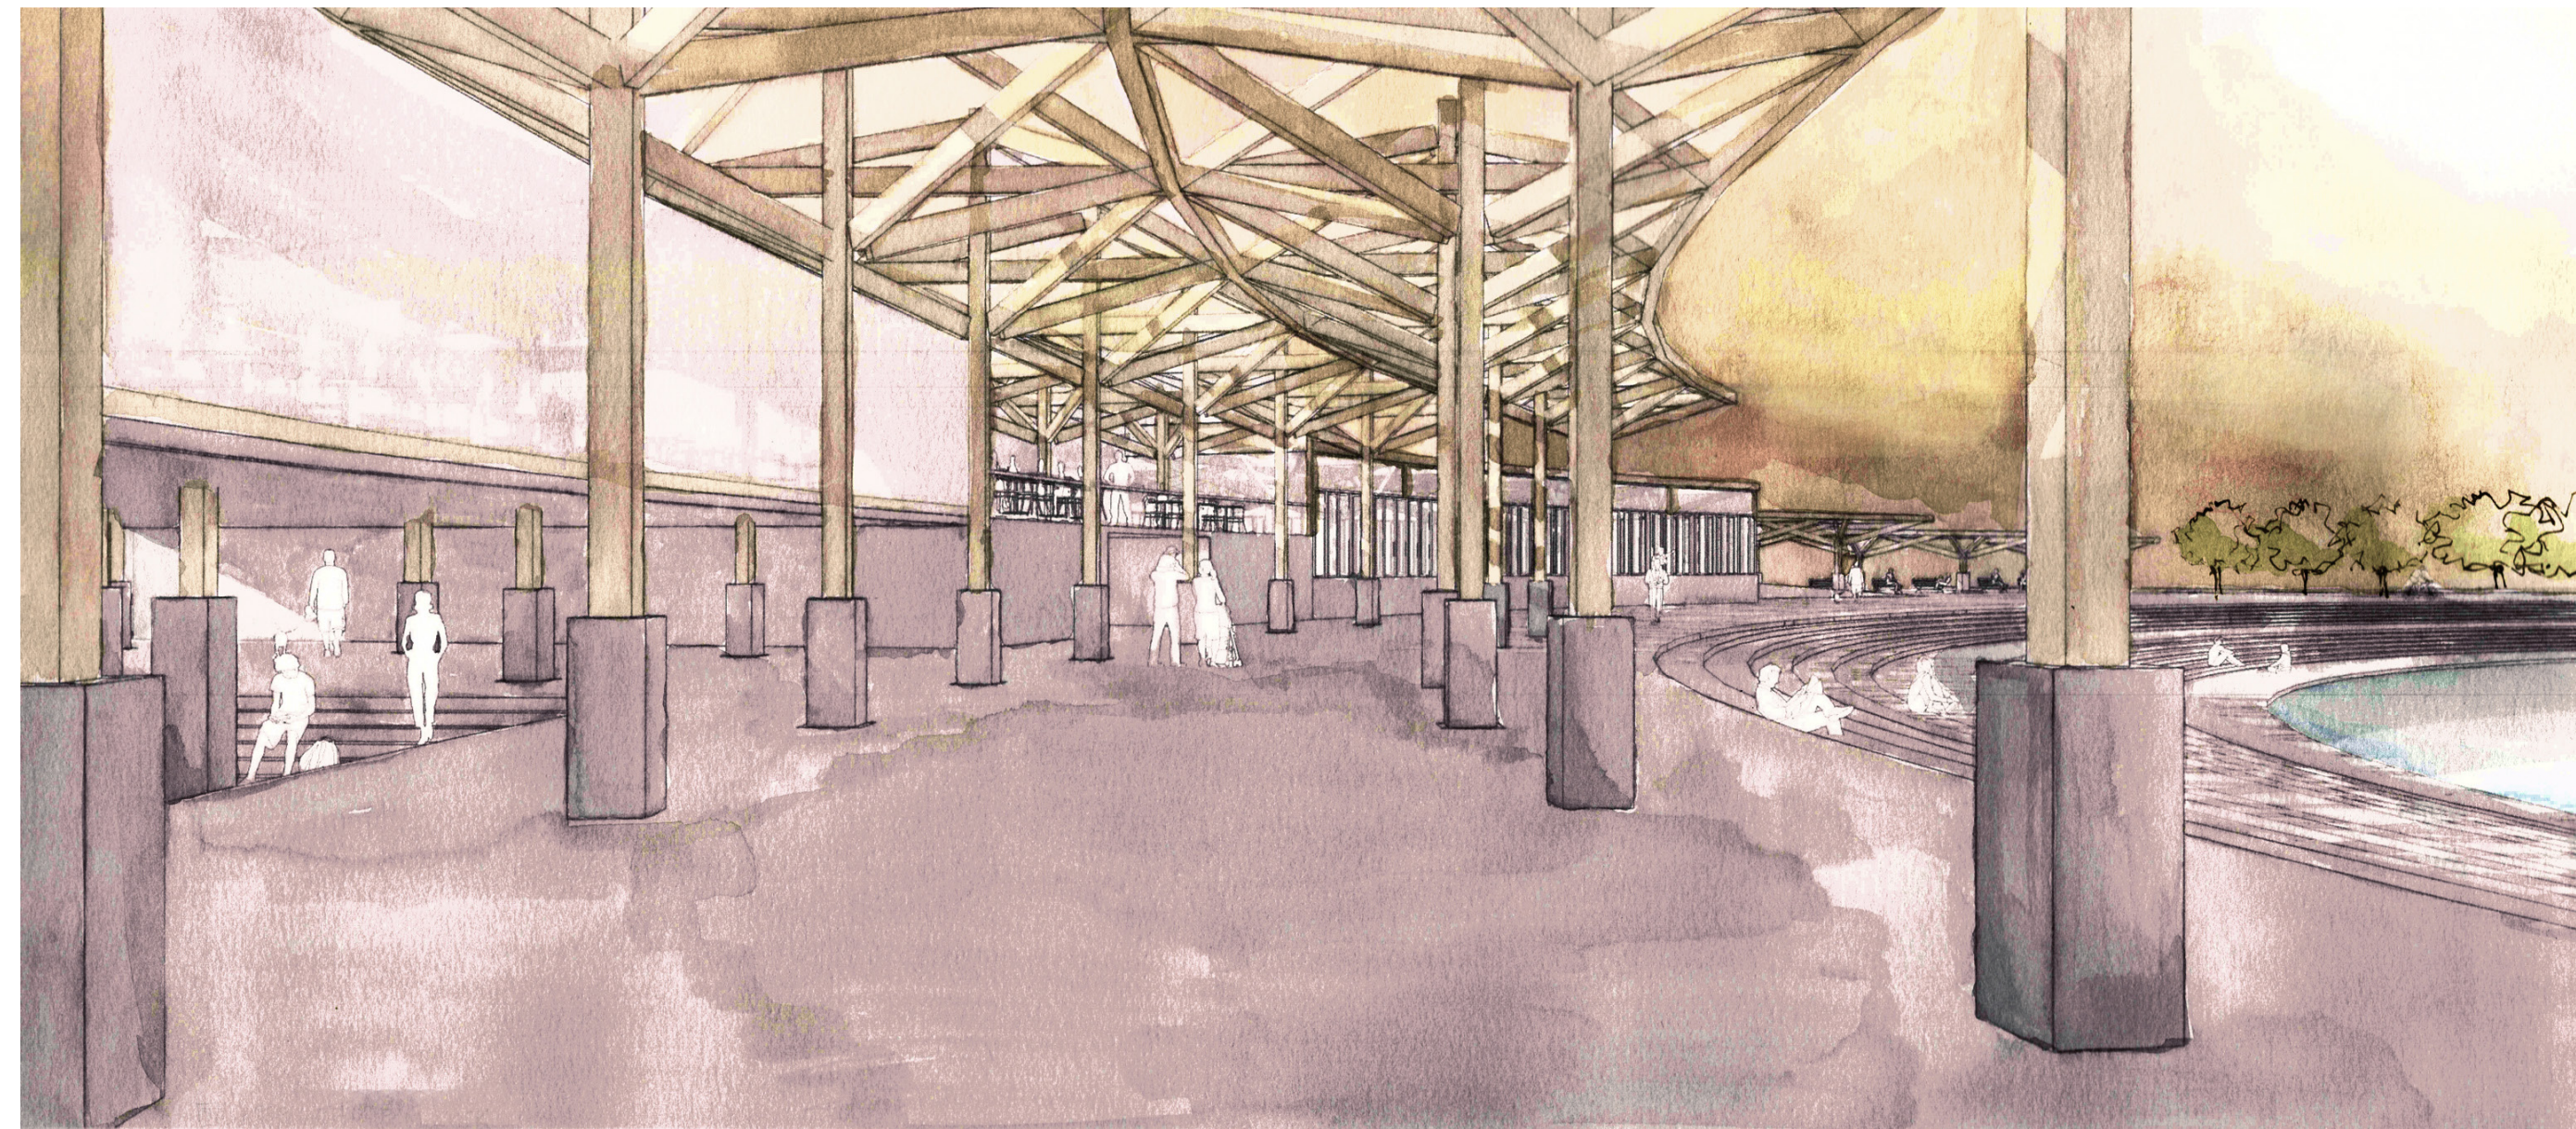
View of Restaurant and gallery when arriving to the plaza from the water pavilion
